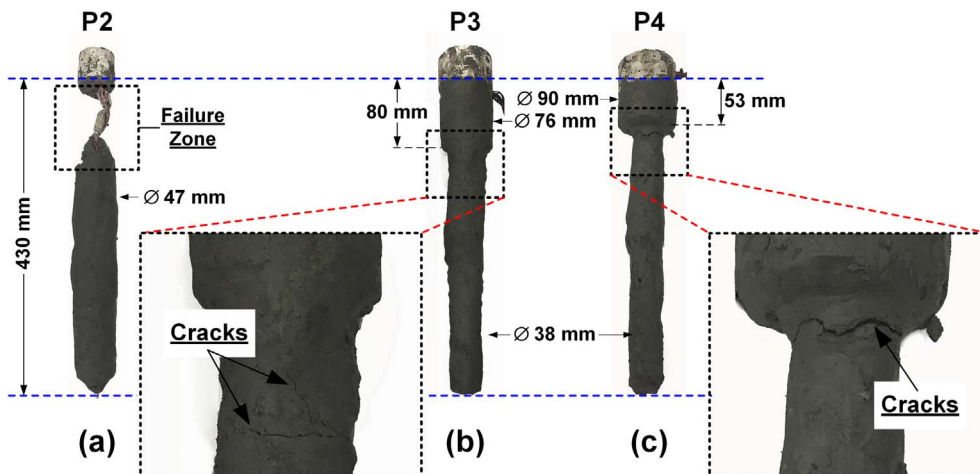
Photographs showing the failure patterns of conventional DCM and TDM piles after testing.
